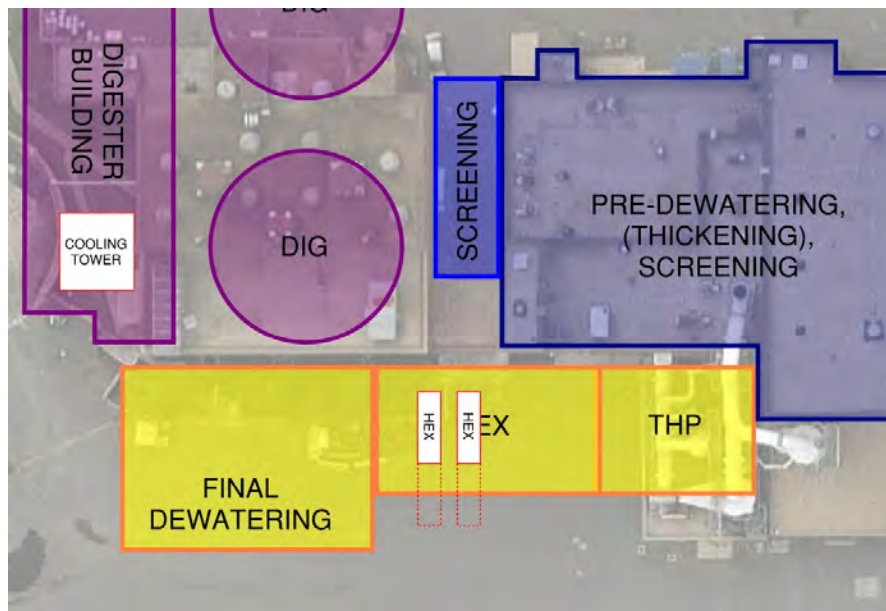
Evaporative Cooling Tower (Plume Abatement): Equipment Plan View—Renovate Dewatering Building Option
